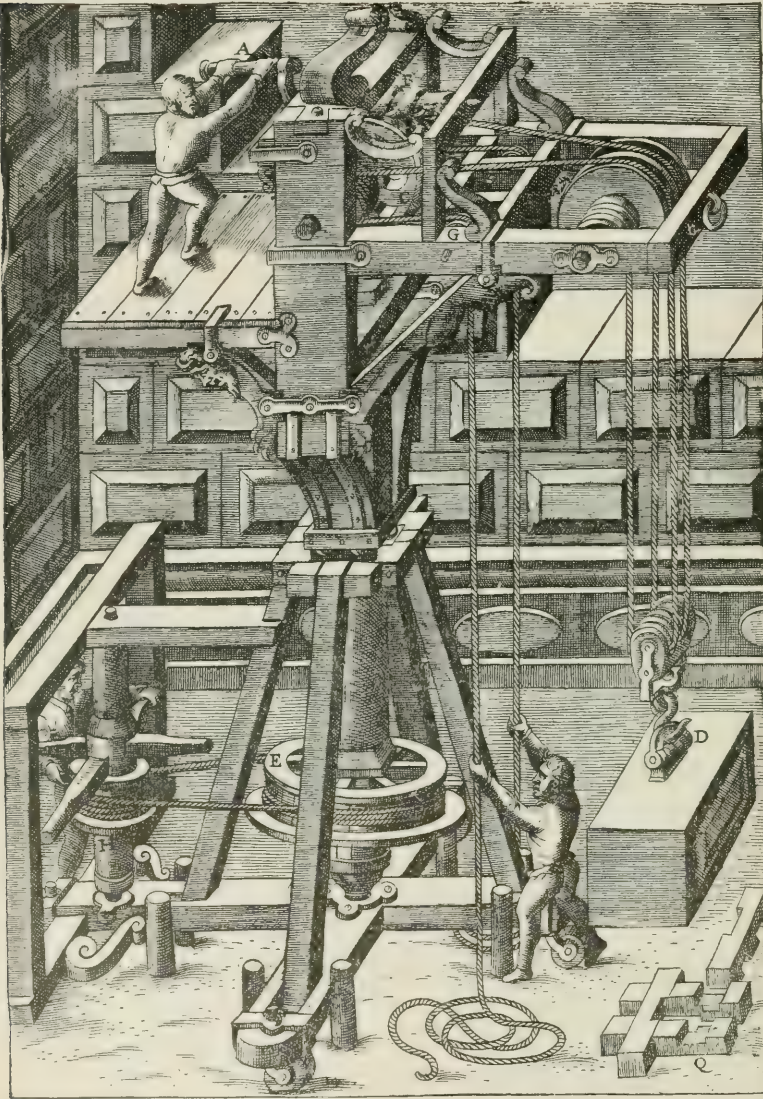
ANCIENT PORTABLE CRANE FOR SETTING STONE.
